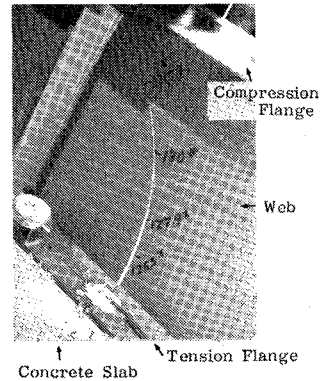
Fatigue Crack Development in Web of Beam E 2-1-1.
